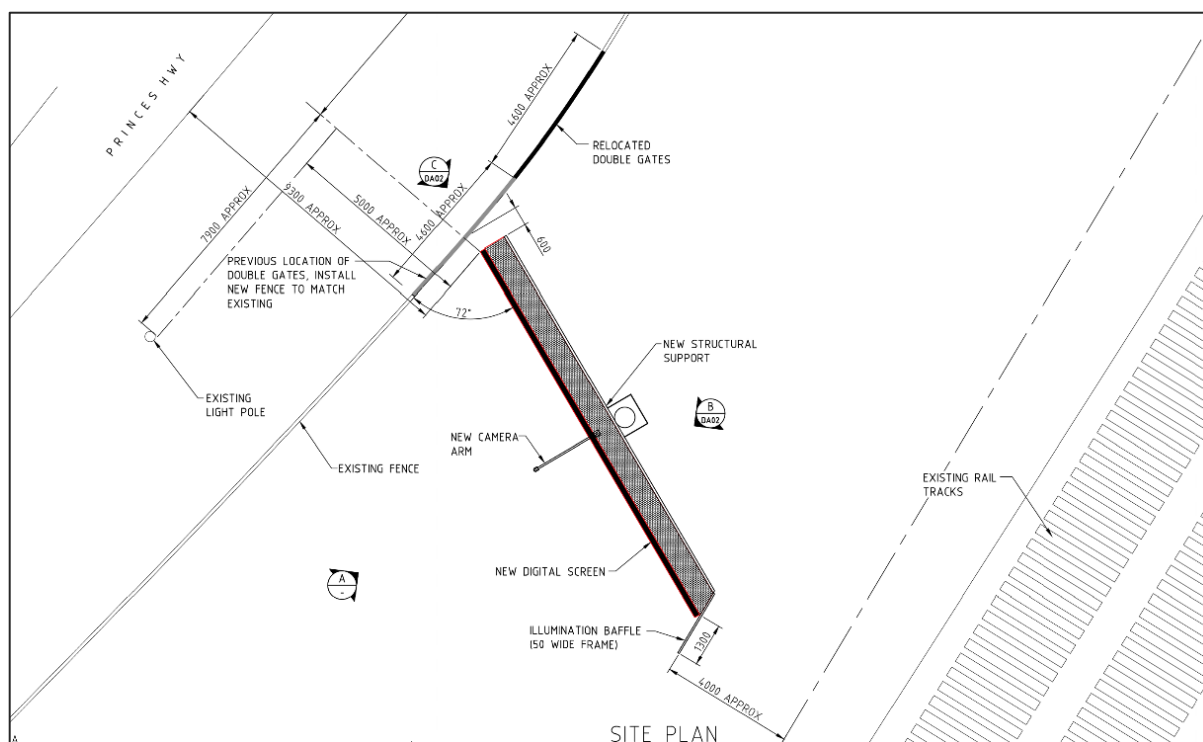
| Proposed site plan (Source: Applicant's documentation)
